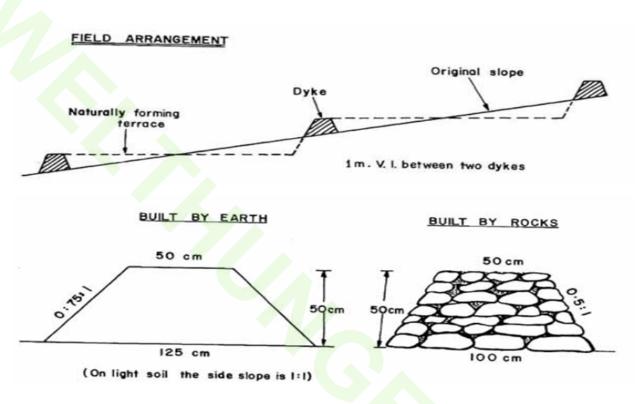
The segment of a terrace, built with earth (left) or stone (right).
